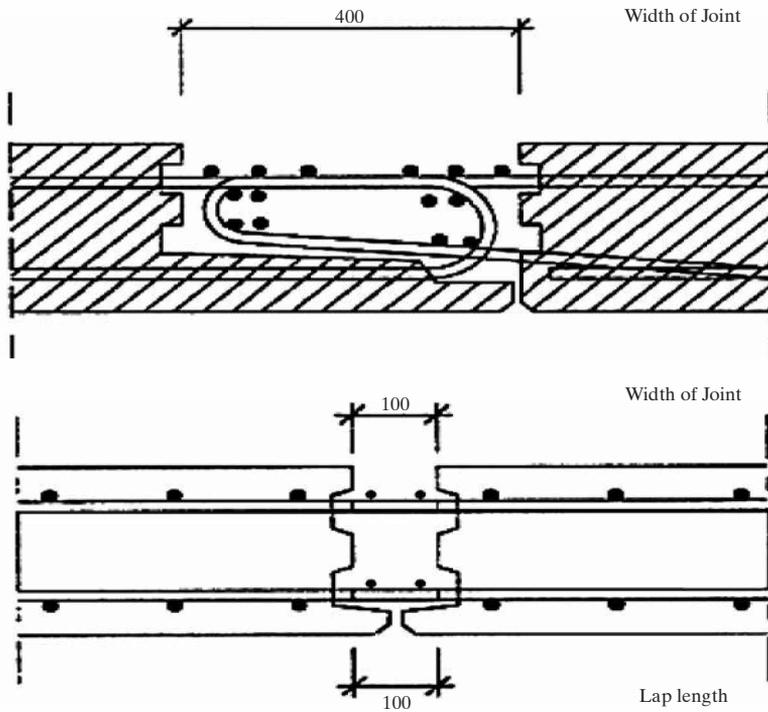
Comparison of joints between prefabricated deck slabs: a conventional joint and new joint
